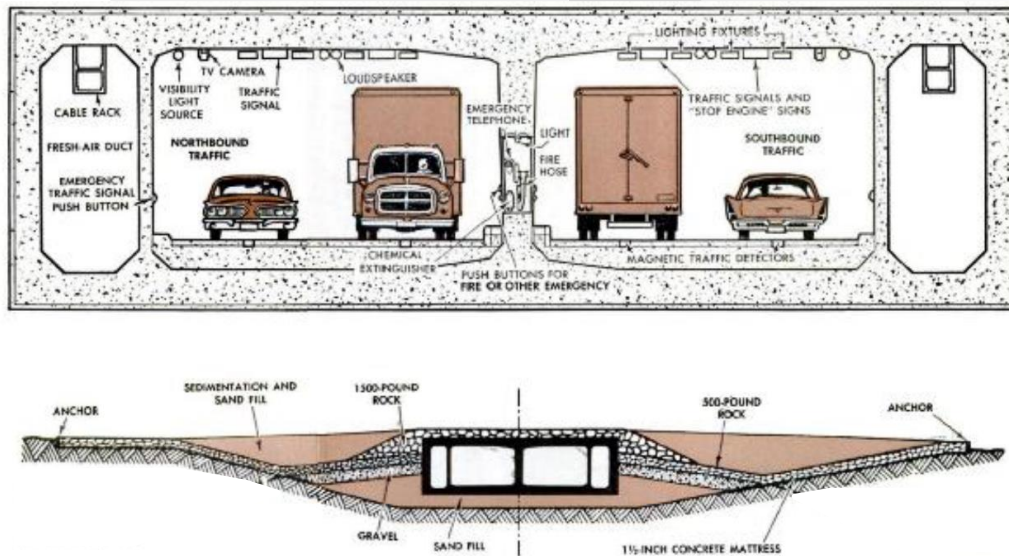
Typical Cross Section of the George Massey Tunnel as originally constructed (extracted from Westmar Advisors, 2018)
